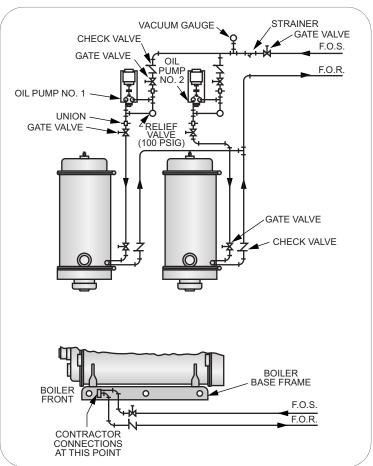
No. 2 Oil Piping, Multiple Boiler Installation, Remote Oil Pumps
